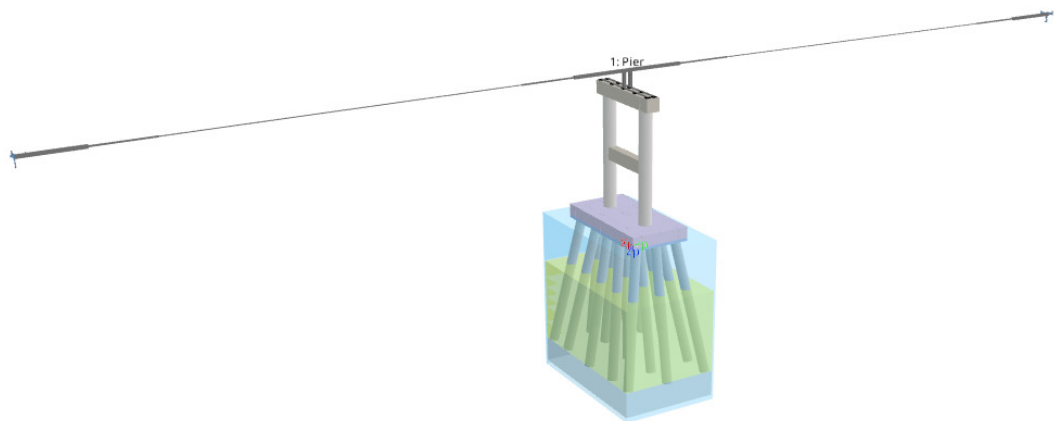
OPTS (One Pier Two Span) model for channel pier 3
